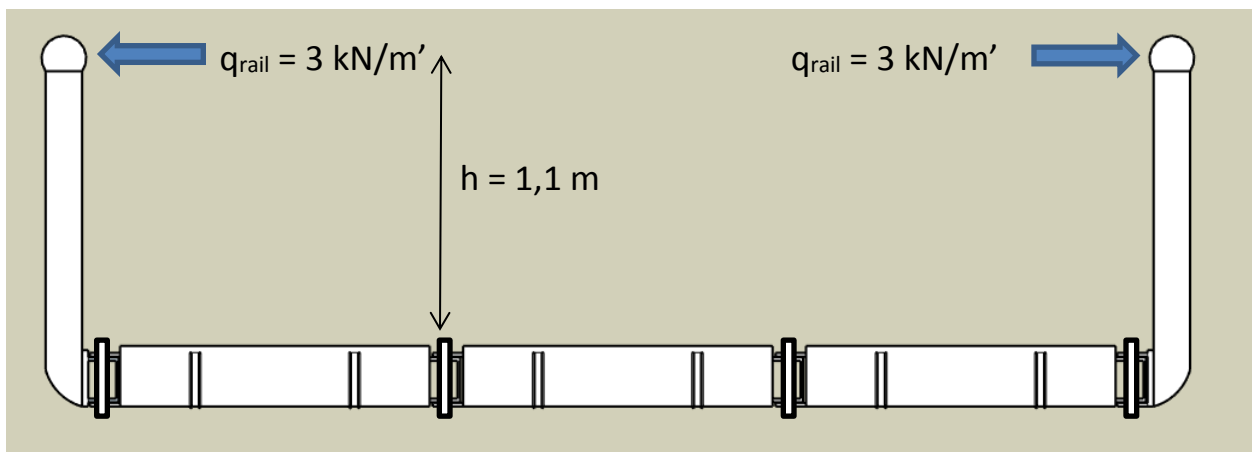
Use of the existing longitudinal connection for the railing and governing load conditions
